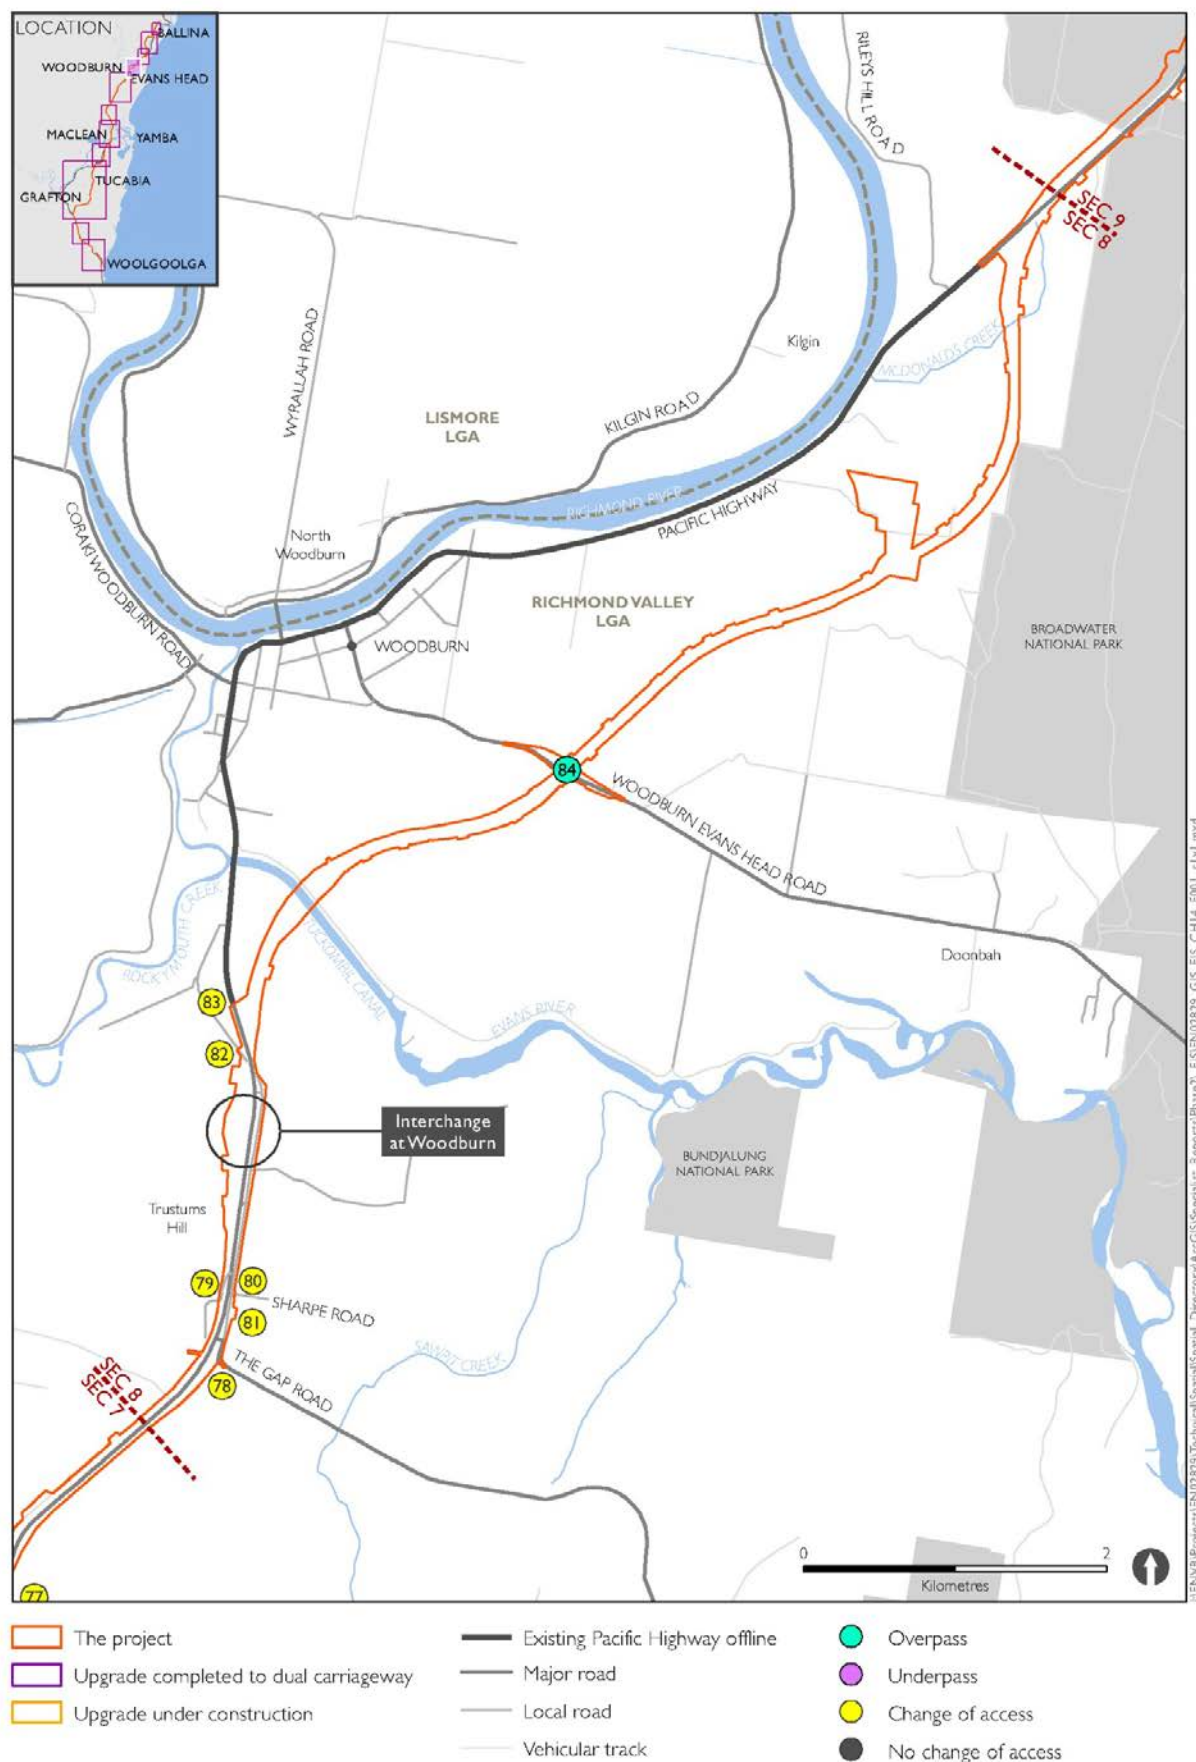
Locations of road alterations or changed access arrangements: Section 8
